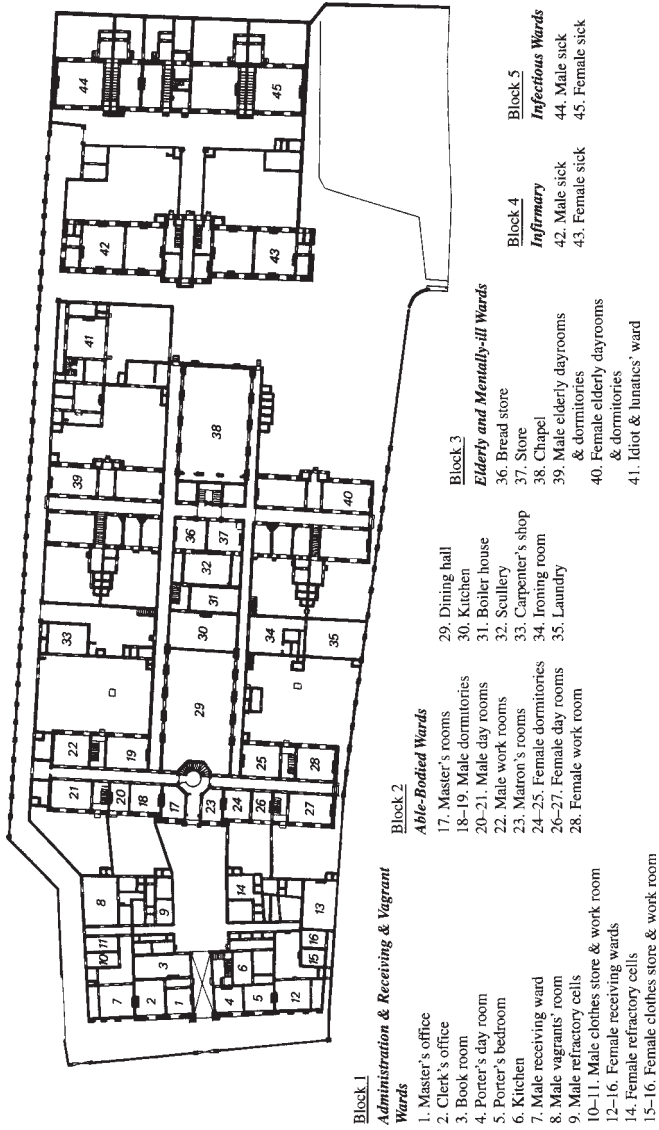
Ground-floor plan of main workhouse building (based on Ordnance Survey 1868 10-inch series)
